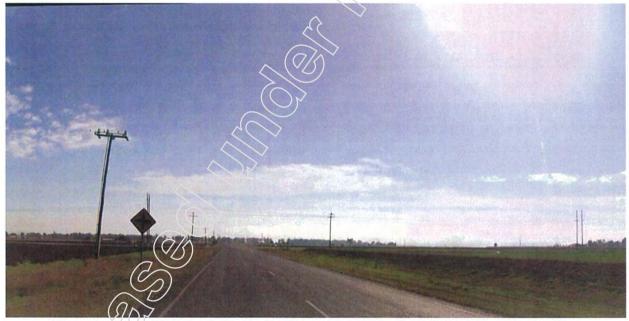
Forest Hill Fernvale Road - Northbound Approach - Faded Intersection Warning Sign
